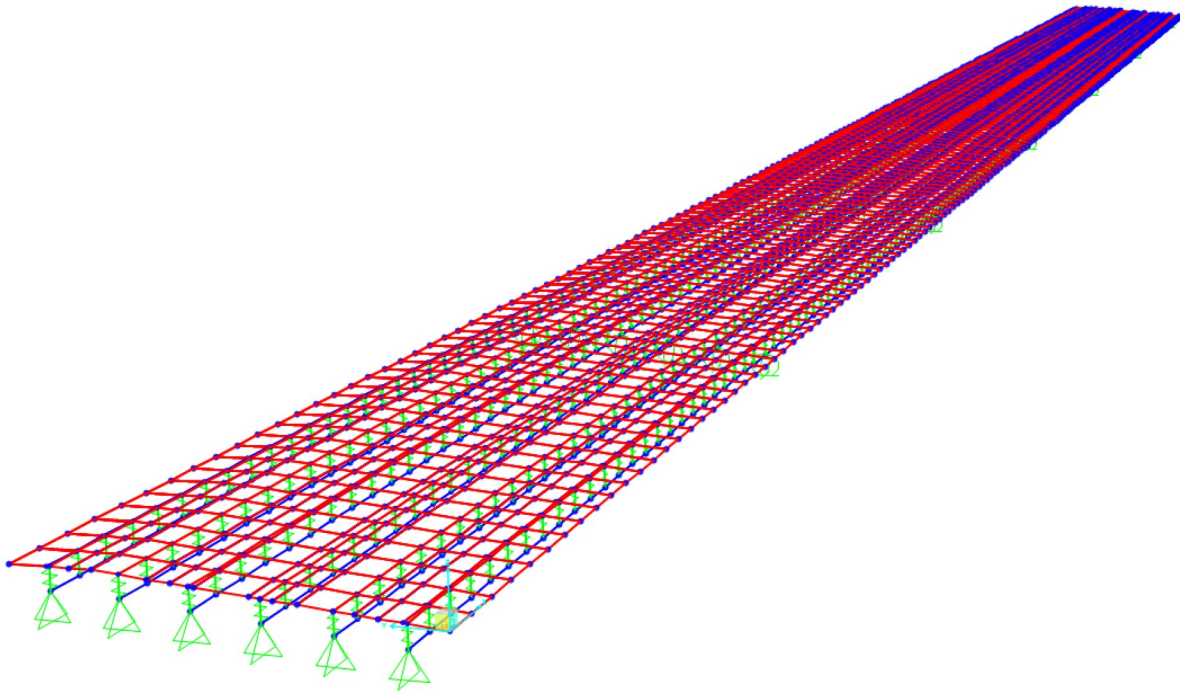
CSiBridge Finite Element Model of Straight Bridge with Lanes
